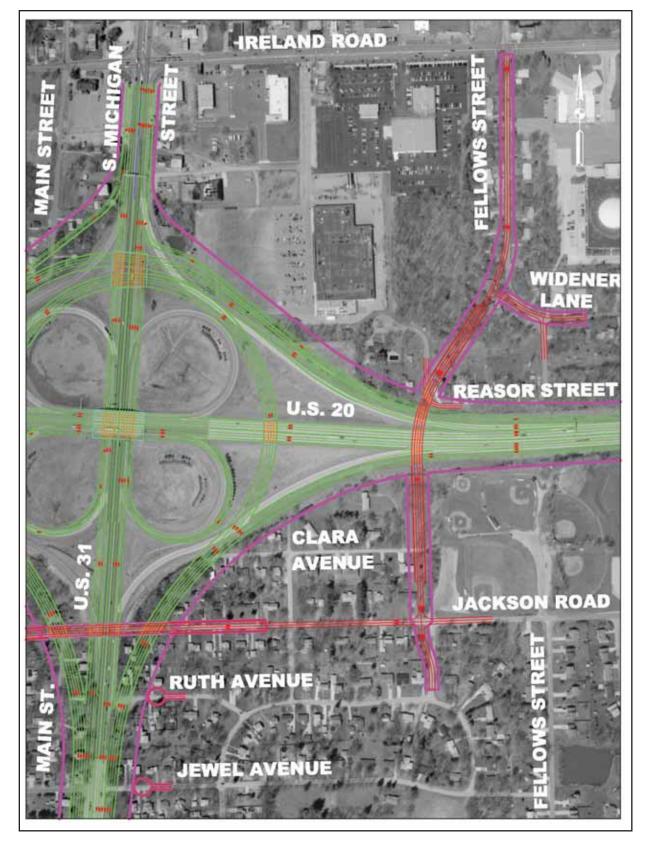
Fellows Street Extension Local Roadway Improvement Project
